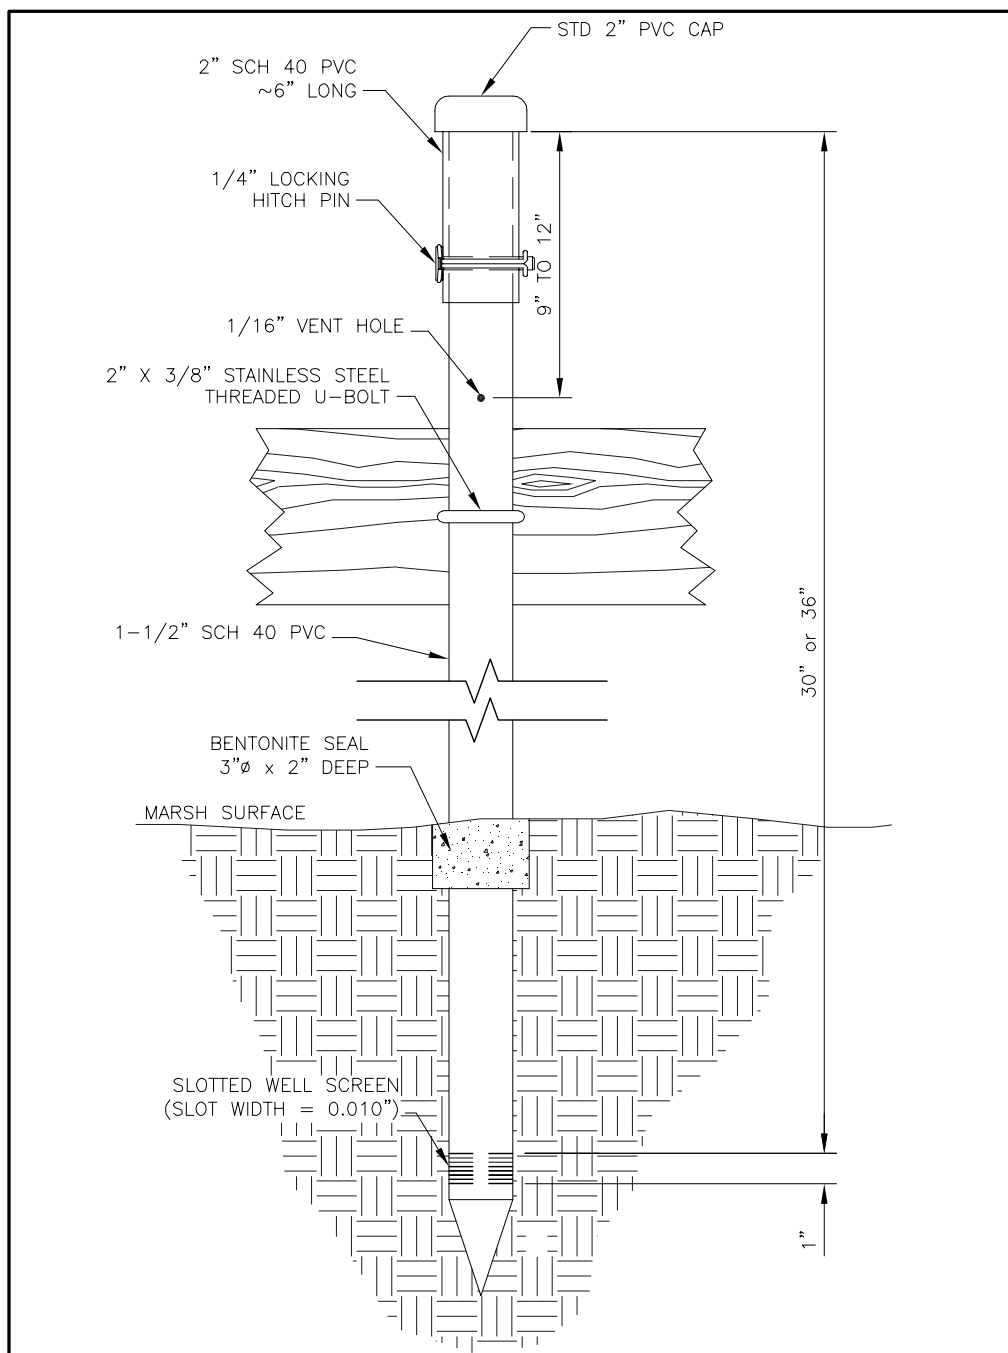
A: Detailed drawing of an individual soil pore water well construction.
